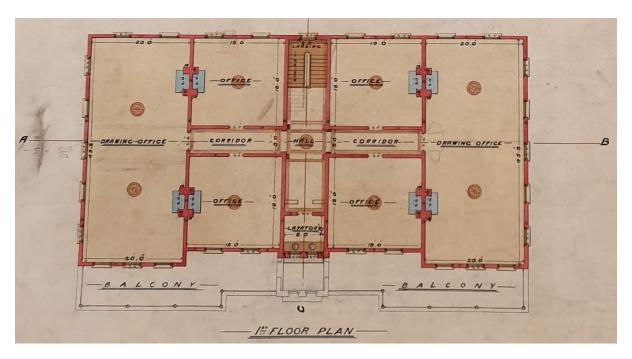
First-floor plan of the original 1887 construction of the CME Building. Source: Rappaport & Caldis Cook Group, 1997.
